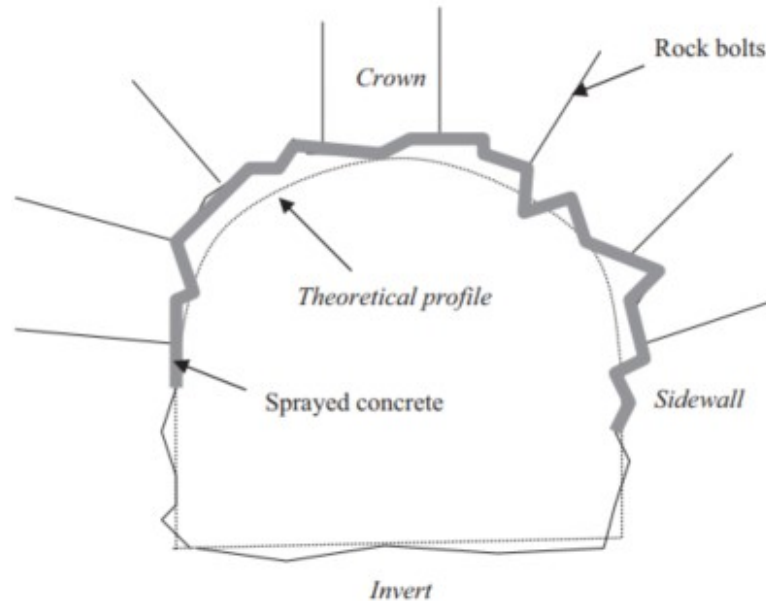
Cross-section of an SCL tunnel in hard rock tunneling sprayed concrete with rock bolts [11].
